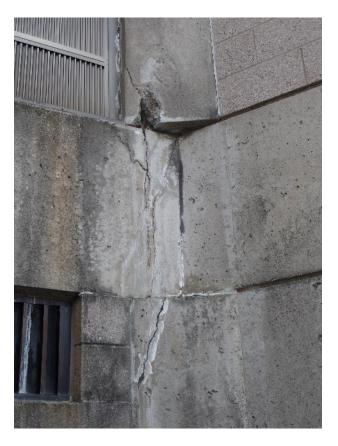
Corrosion/Spalled Concrete Cover and Cracking/Deterioration
